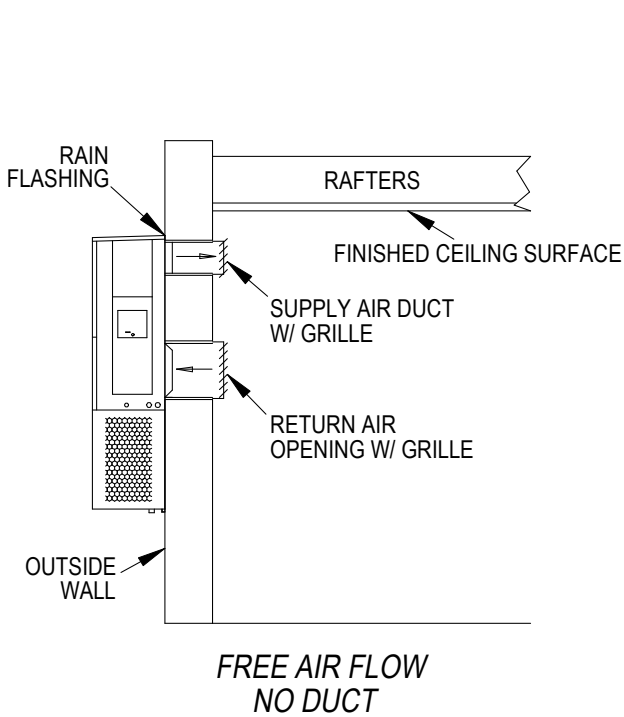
WALL MOUNTING INSTRUCTIONS
